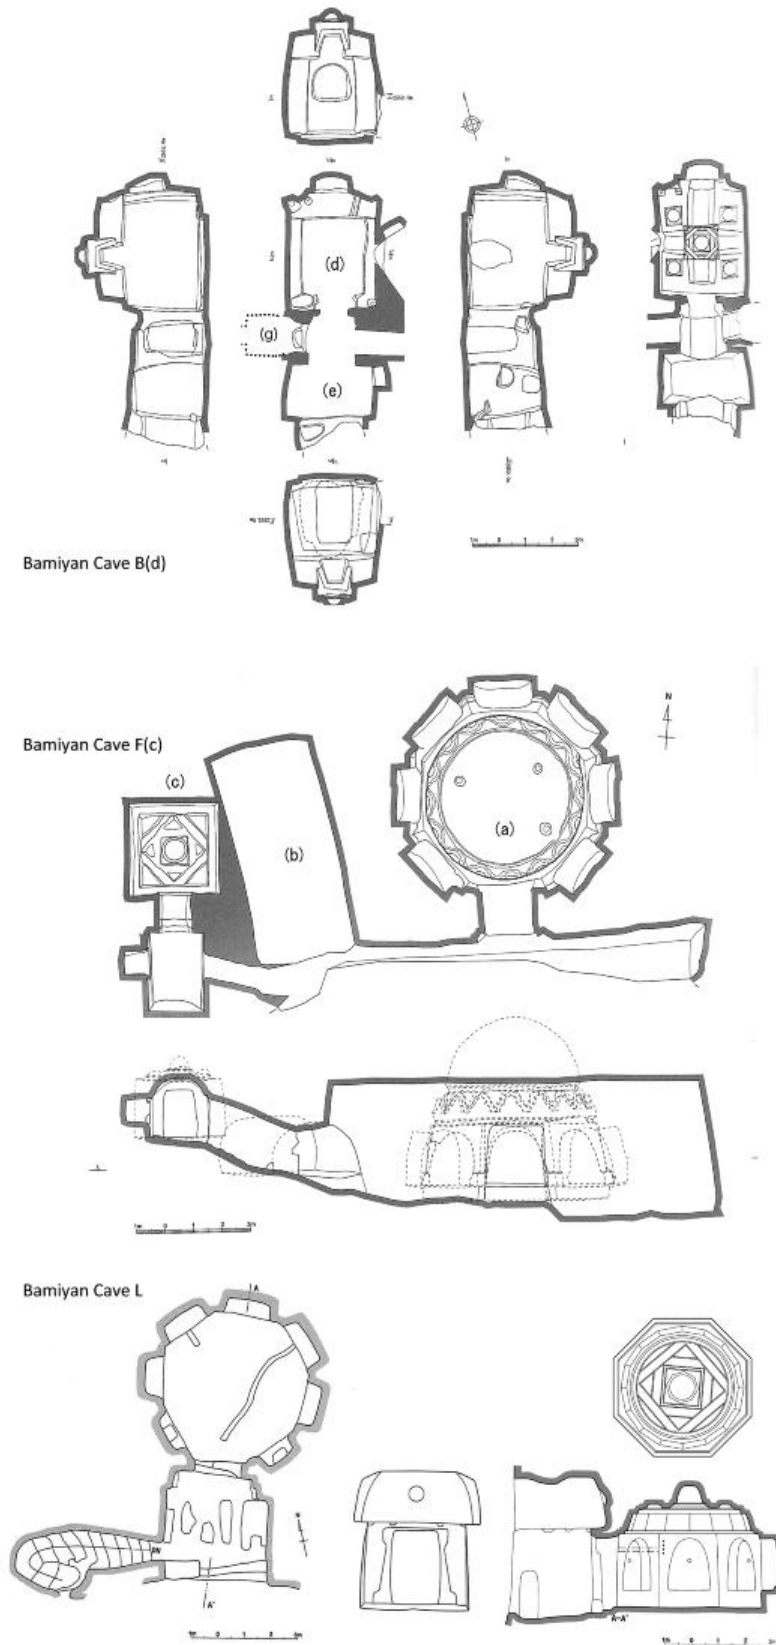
Caves with Laternendecke ceilings in Bamiyan: B(d), F(c) and L (after Iwade and Kubodera 2013: 108, fig. 272; 67, fig. 144; 81, fig. 189).
